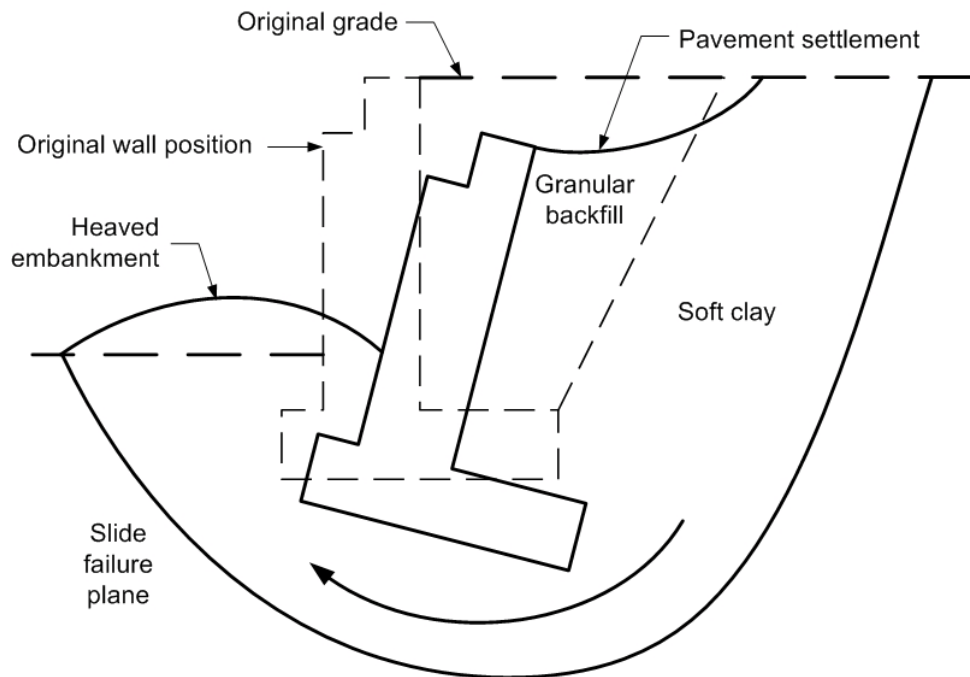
Lateral Movement of an Abutment due to Slope Failure
